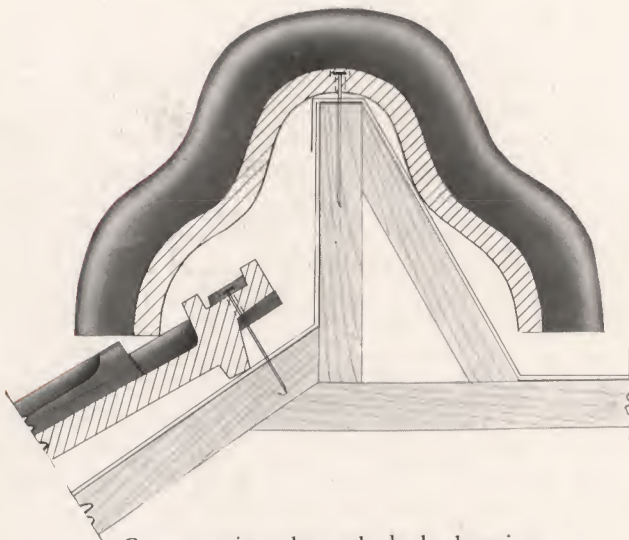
DETAILS OF "IMPERIAL" FRENCH TILE AND FITTINGS
